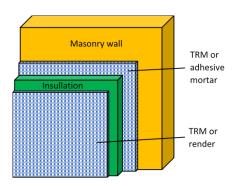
Schematic view of combined structural and energy retrofitting system on one side of the masonry wall.
